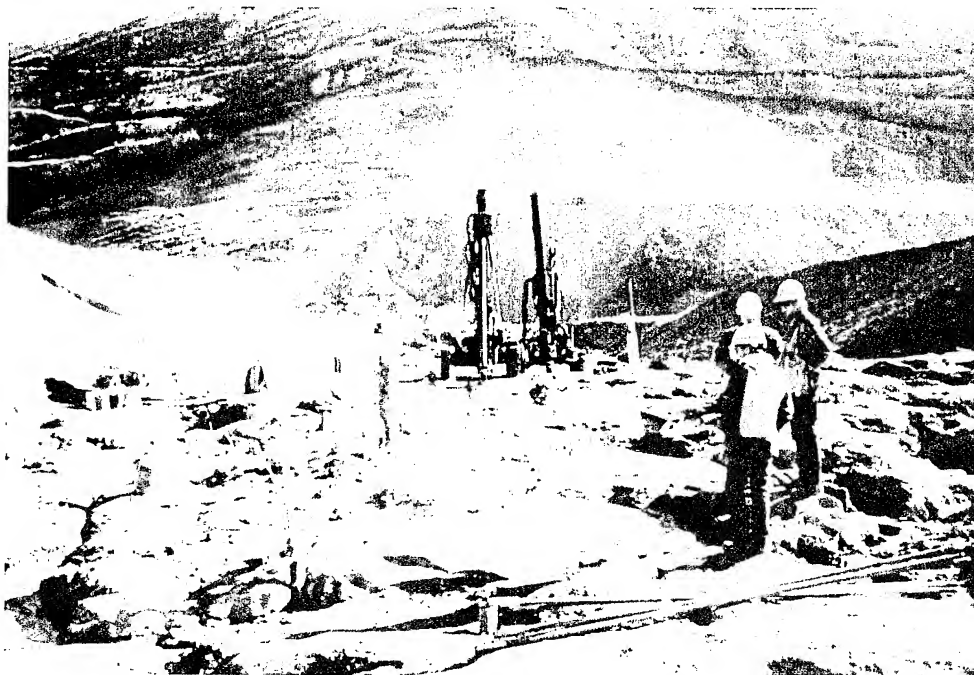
Inspecting the foundation grouting. Looking left at about Sta. 21+00.
